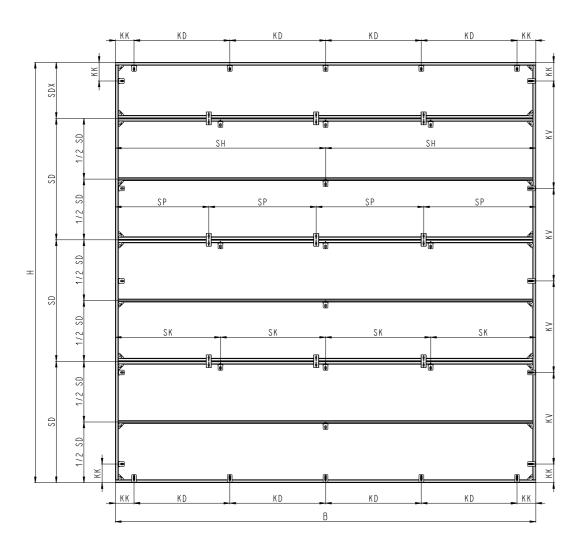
The principle of assembling the basic blocks of walls into the resulting structure wider than $4.5~\mathrm{m}$
